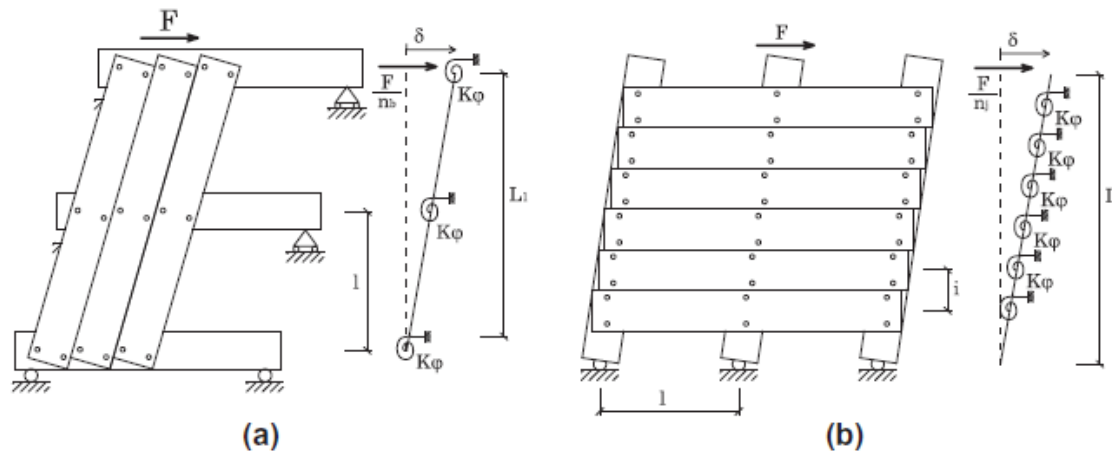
Mechanical model for unstrengthened timber floor with shear force parallel to joists (a) or to boards (b).
